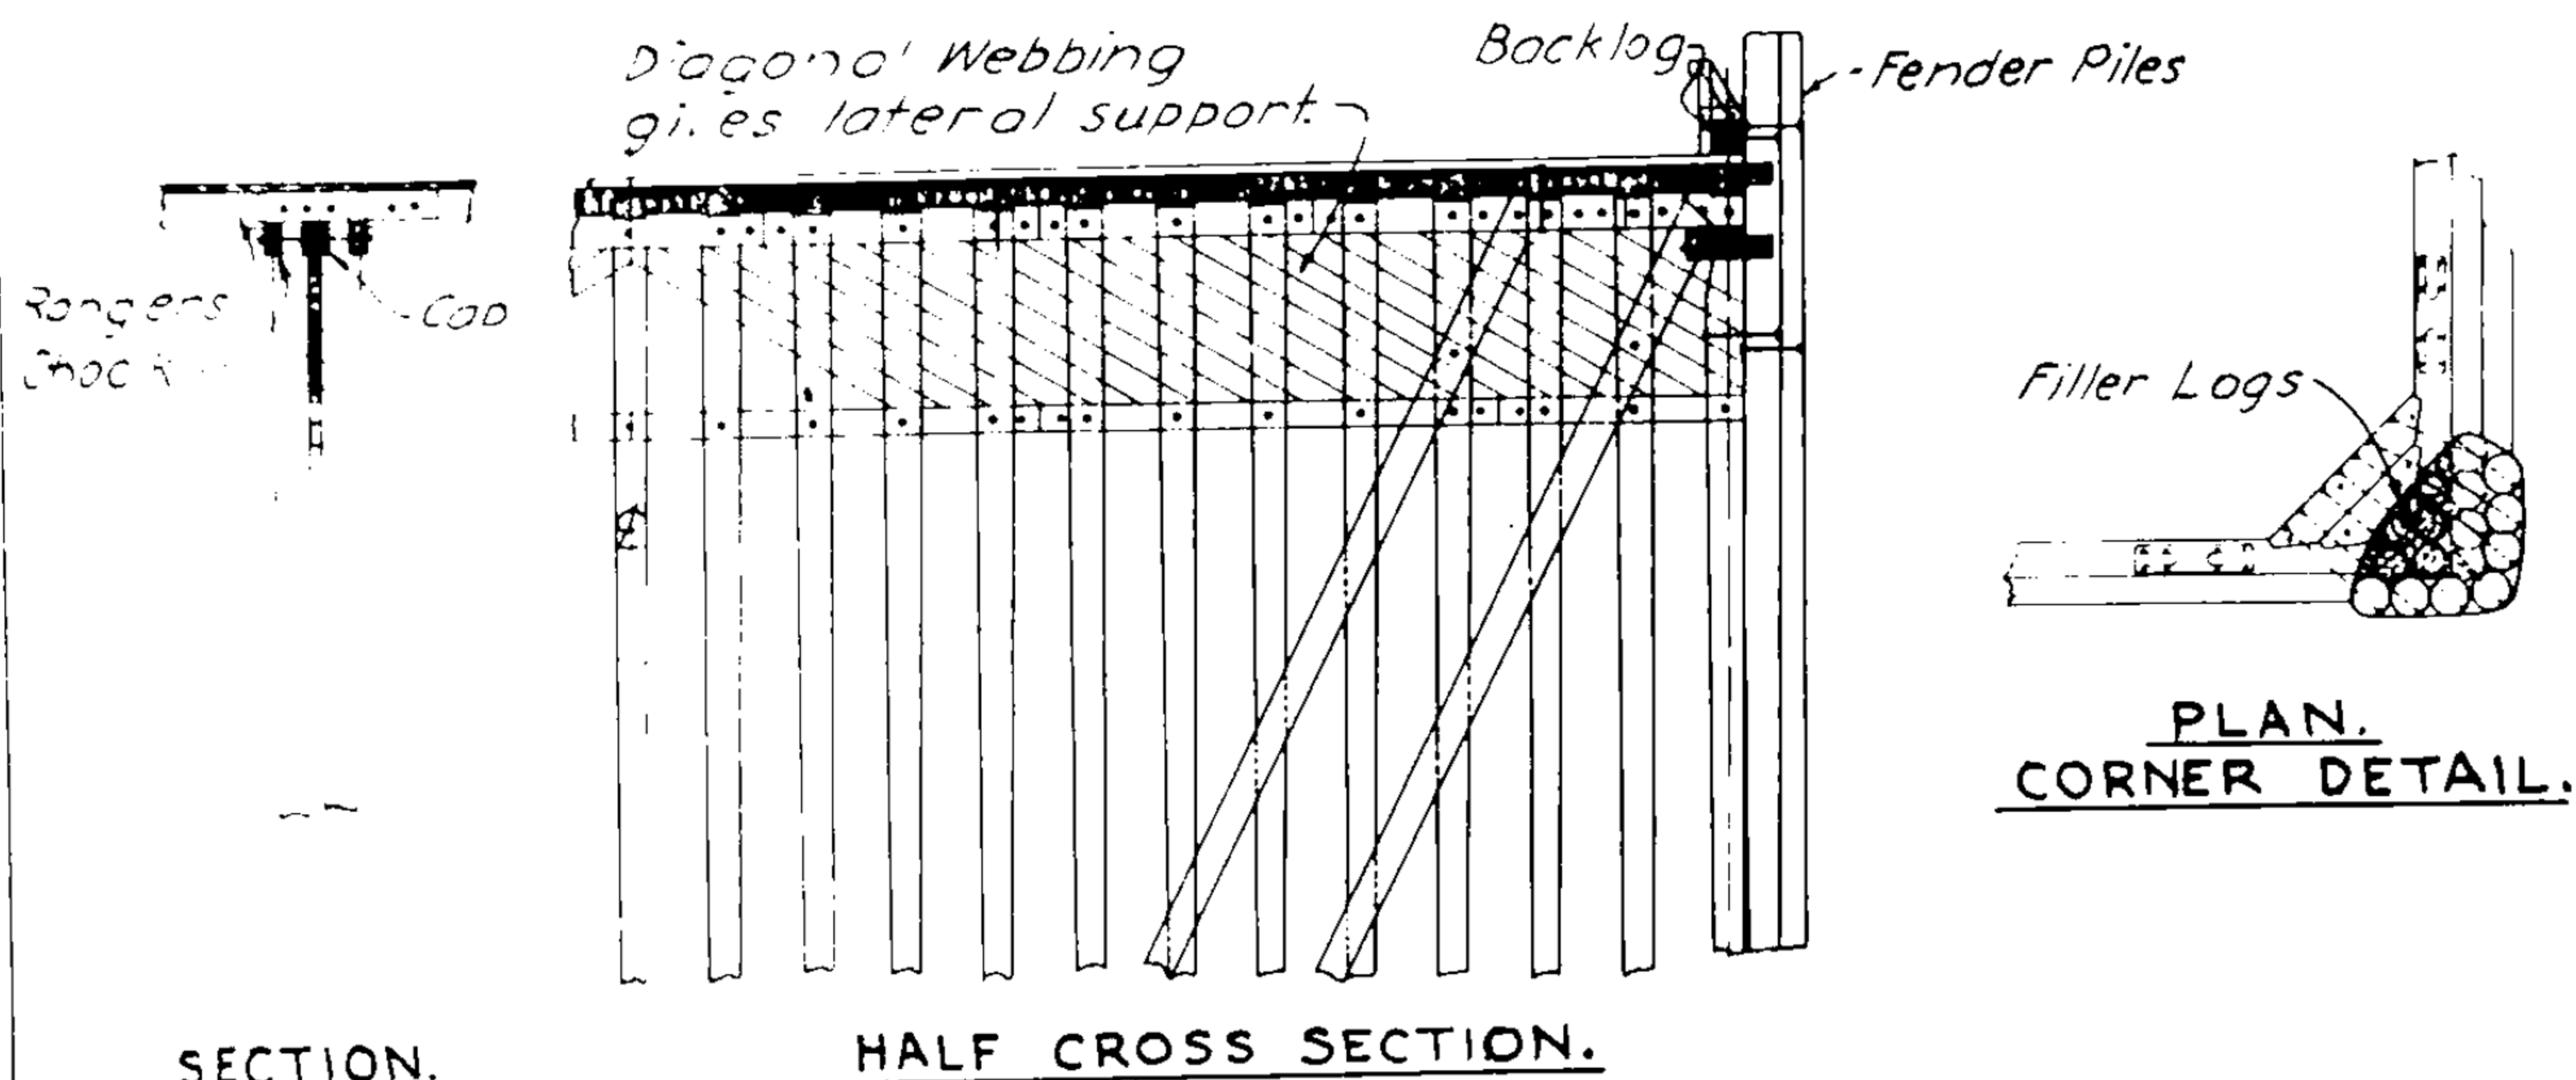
FIG. A - ARMY PIER AT PIERMONT, N.Y.
